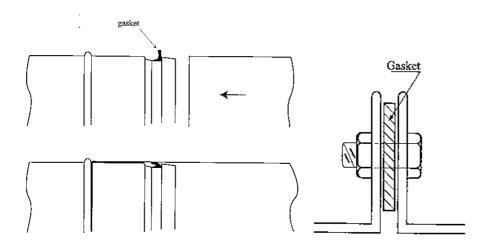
Pre-fitted sealing gaskets for circular ducts. Airtight rivets or plate-screws may be necessary to ensure the mechanical stability of the joint (left). Drive slips, fasteners, rivets or bolts are used to hold the pieces together [6]
